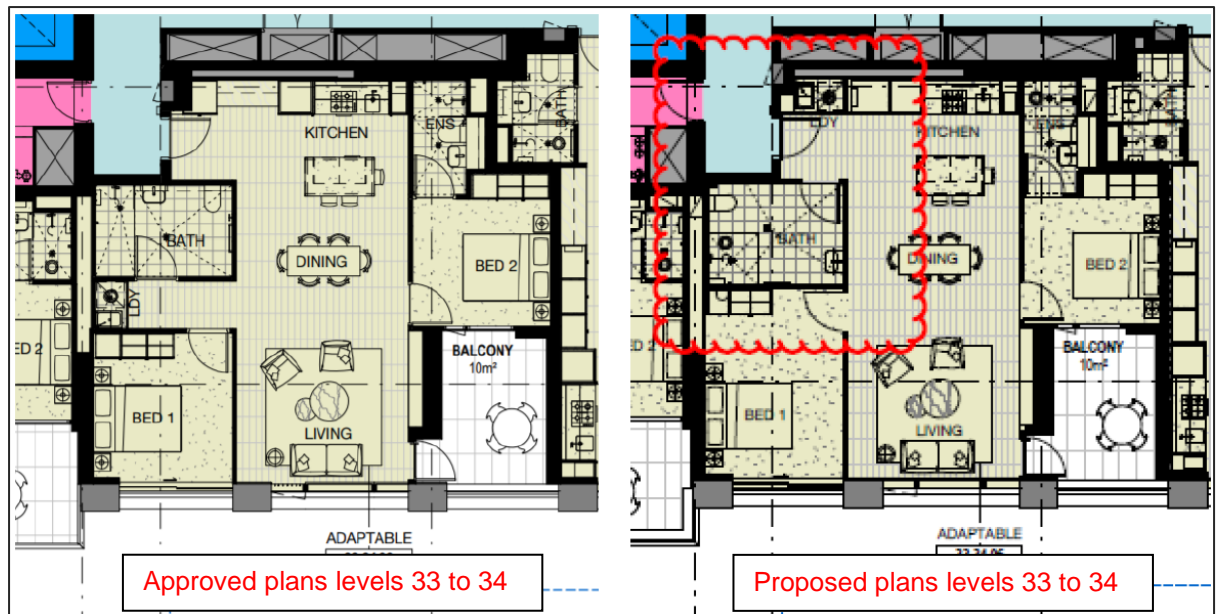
| Adaptable apartment relocation of laundry (Source: Applicant's modification report)
